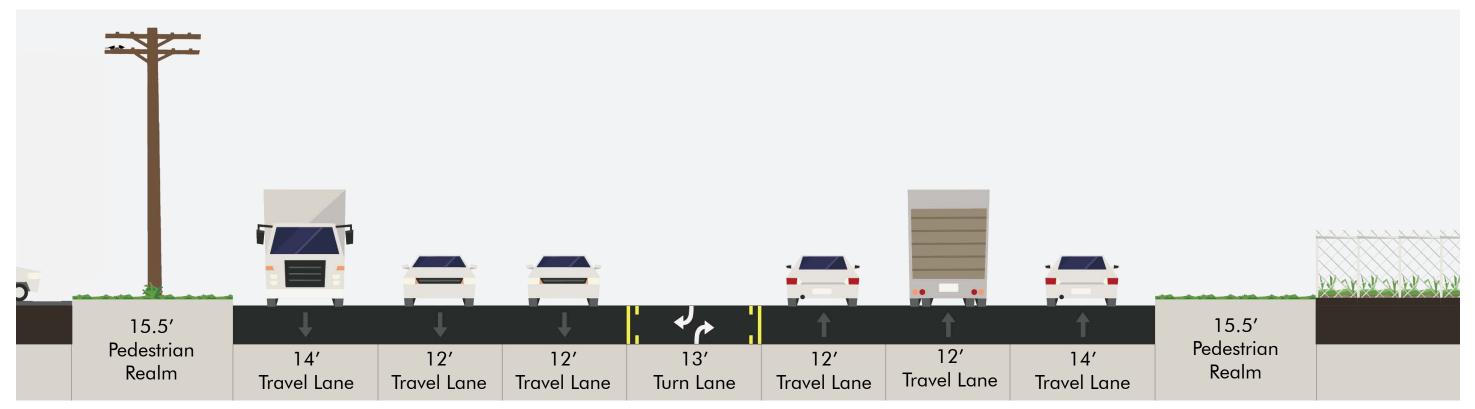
FM 1092 Study Corridor Typical Cross Section
